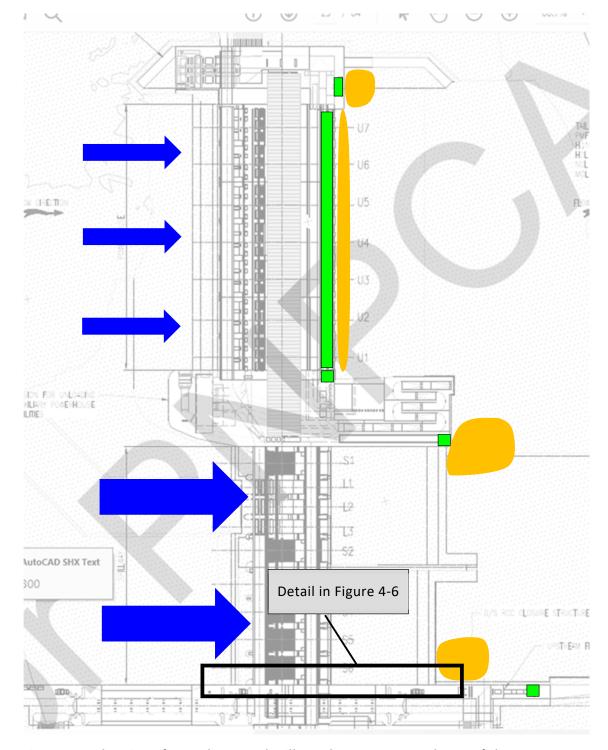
Plan view of powerhouse and spillway showing: proposed LPHPP fishway entrances (green) and zones of fish attraction (orange) at <u>high</u> spillway discharge.
